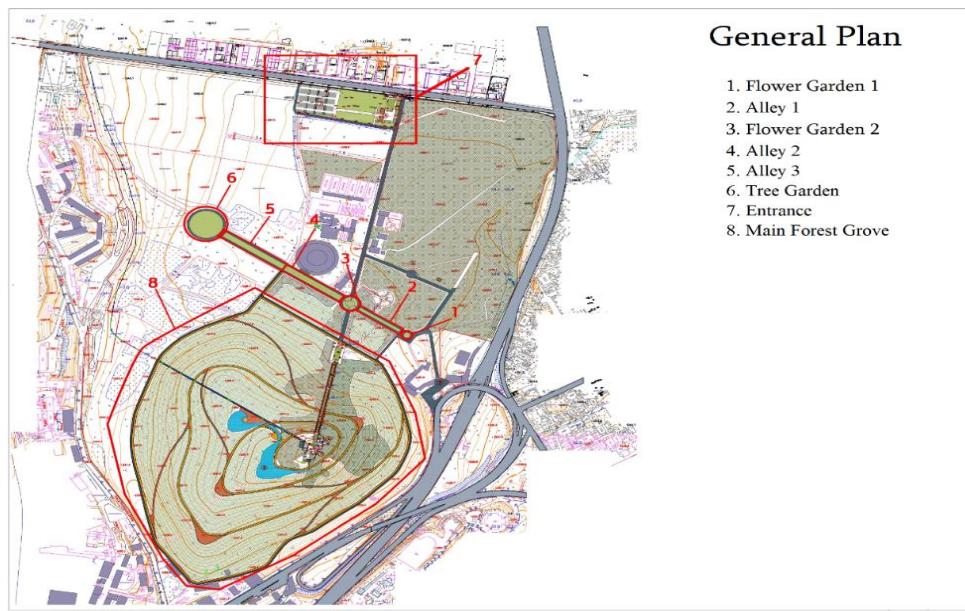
Scheme of Newly Planned Collections in Yerevan Botanical Garden.
